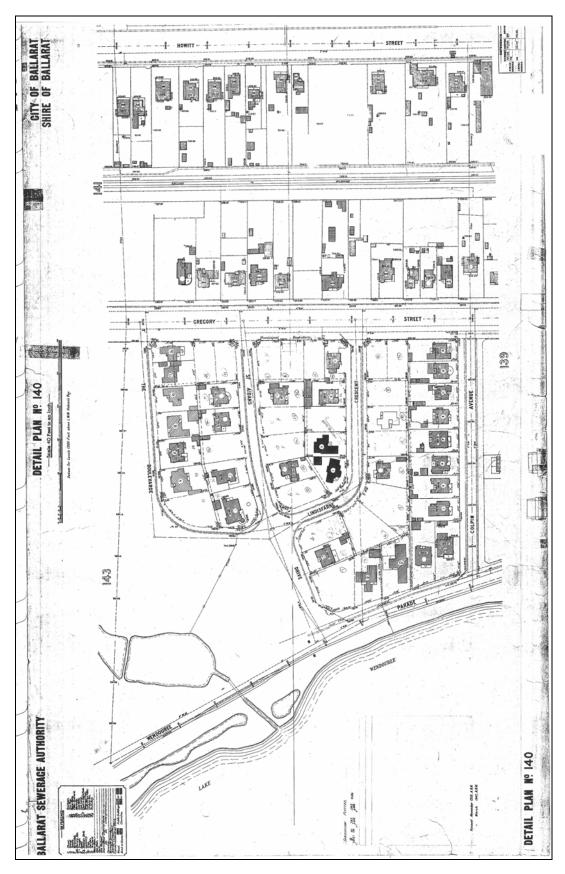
Ballarat Sewerage Authority Plan, 1947(b). Source: Planning Department, City of Ballarat.
